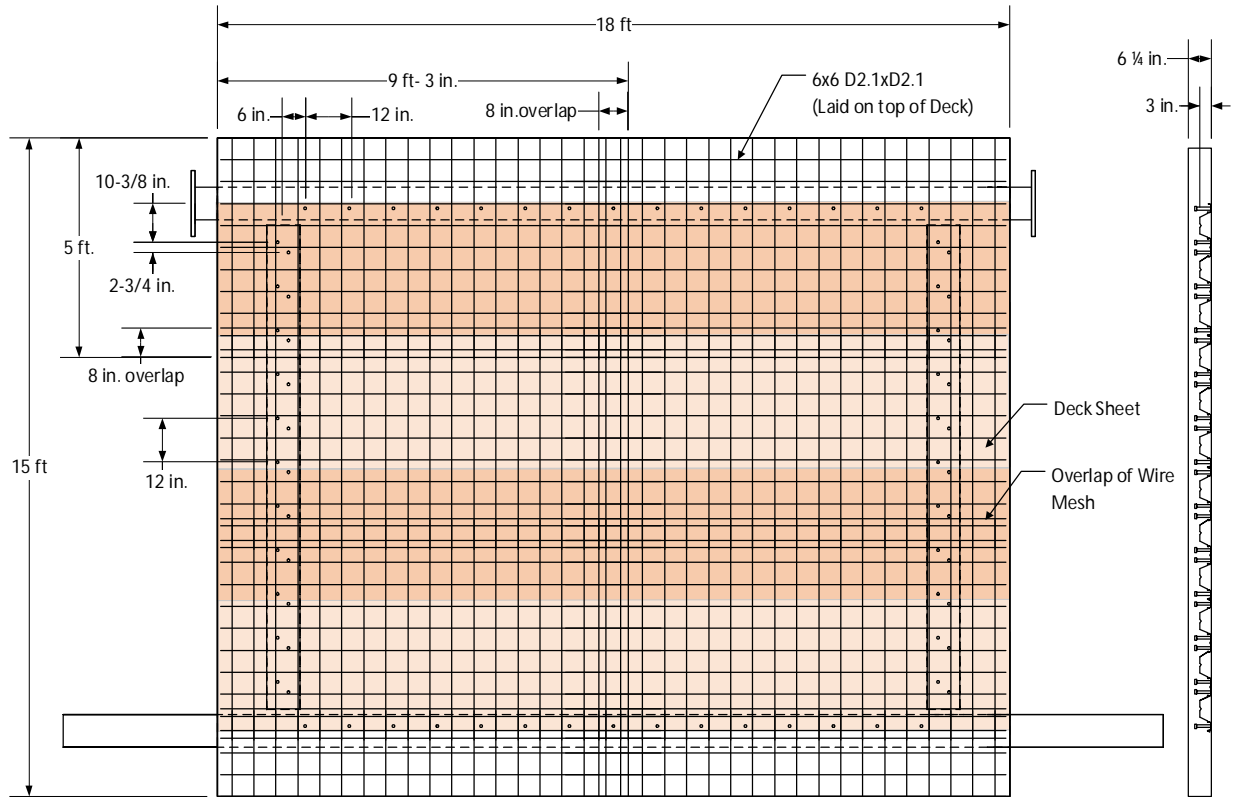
Reinforcement and Headed Stud Placement for Specimen 3/6.25-4-L-RS
